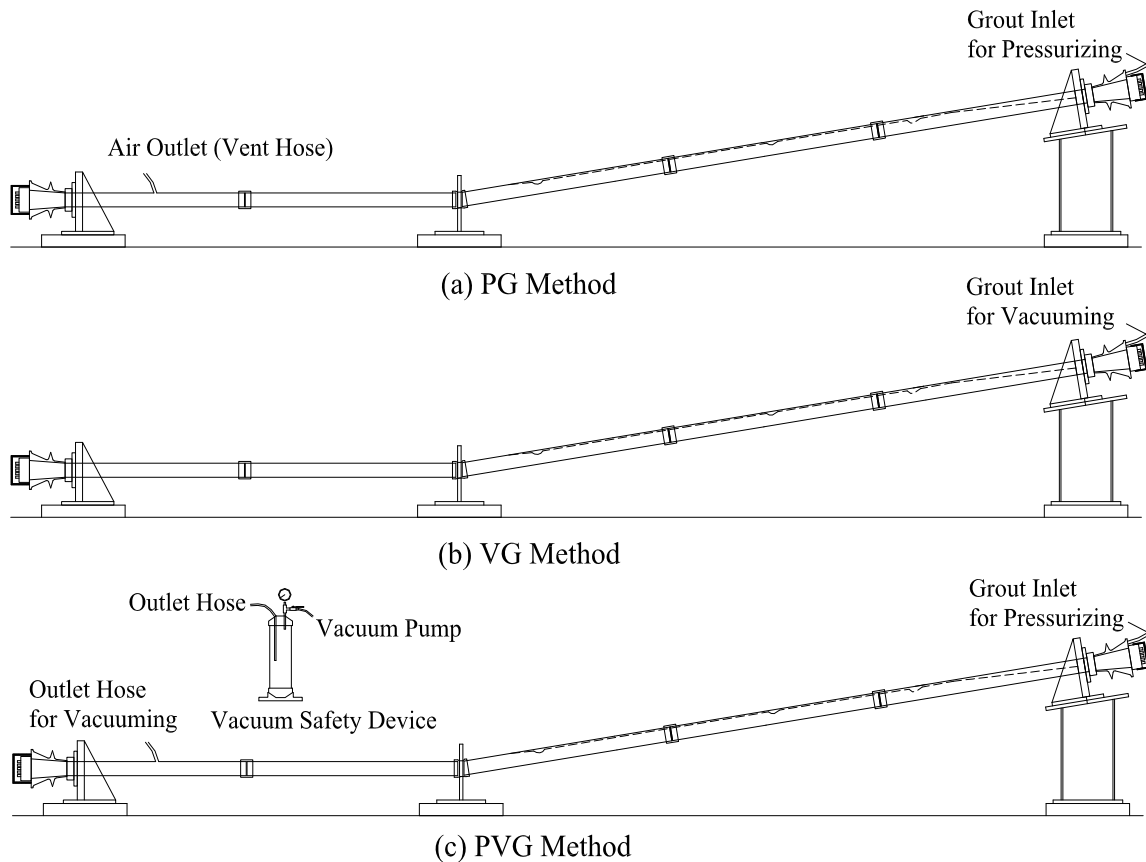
Schematic of PET Specimens Showing the Inlet and Outlet Holes.
